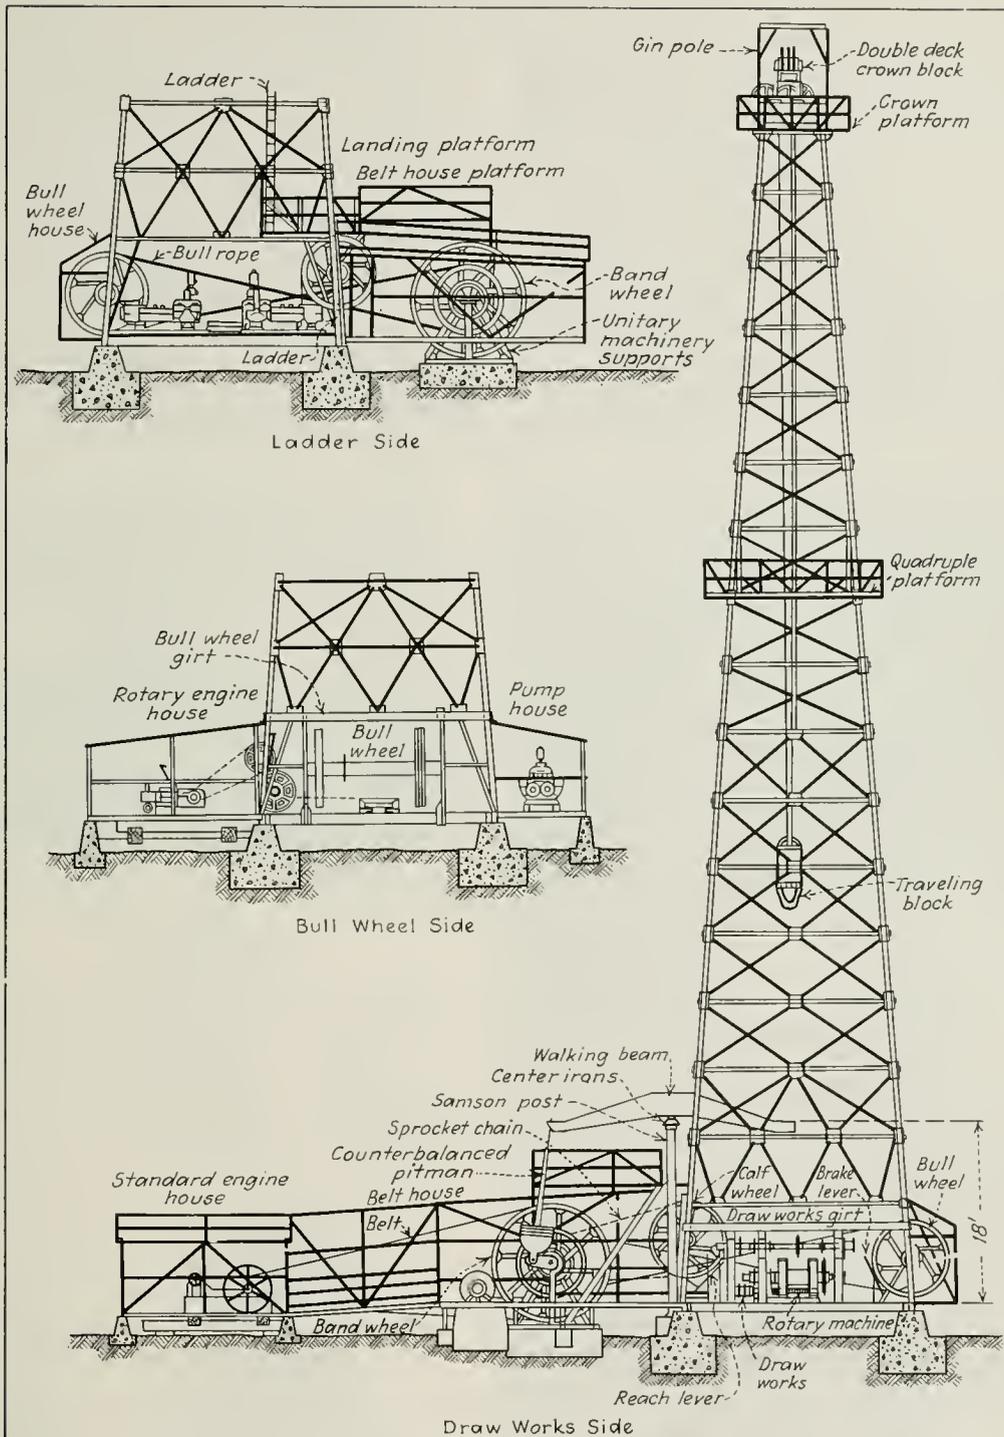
California type combination drilling rig. (Courtesy of McGraw-Hill Book Co., Inc.)
